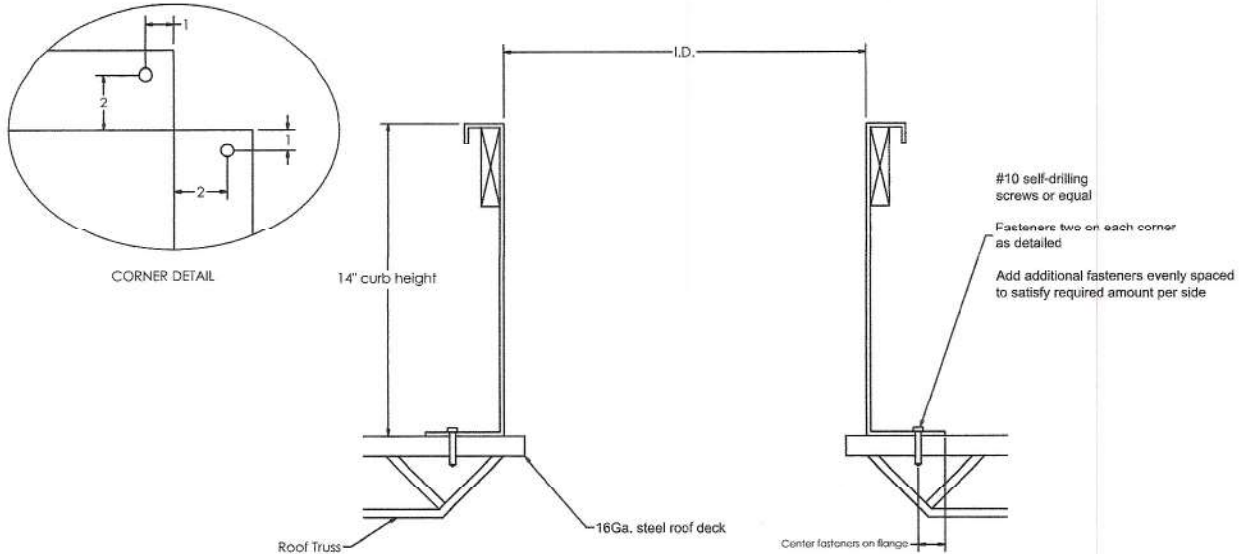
CURB ATTACHMENT TO ROOF
